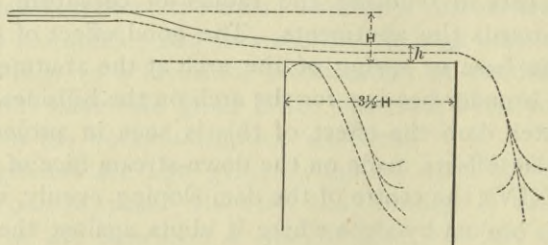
FLOW OVER WIDE-CRESTED DAM.
